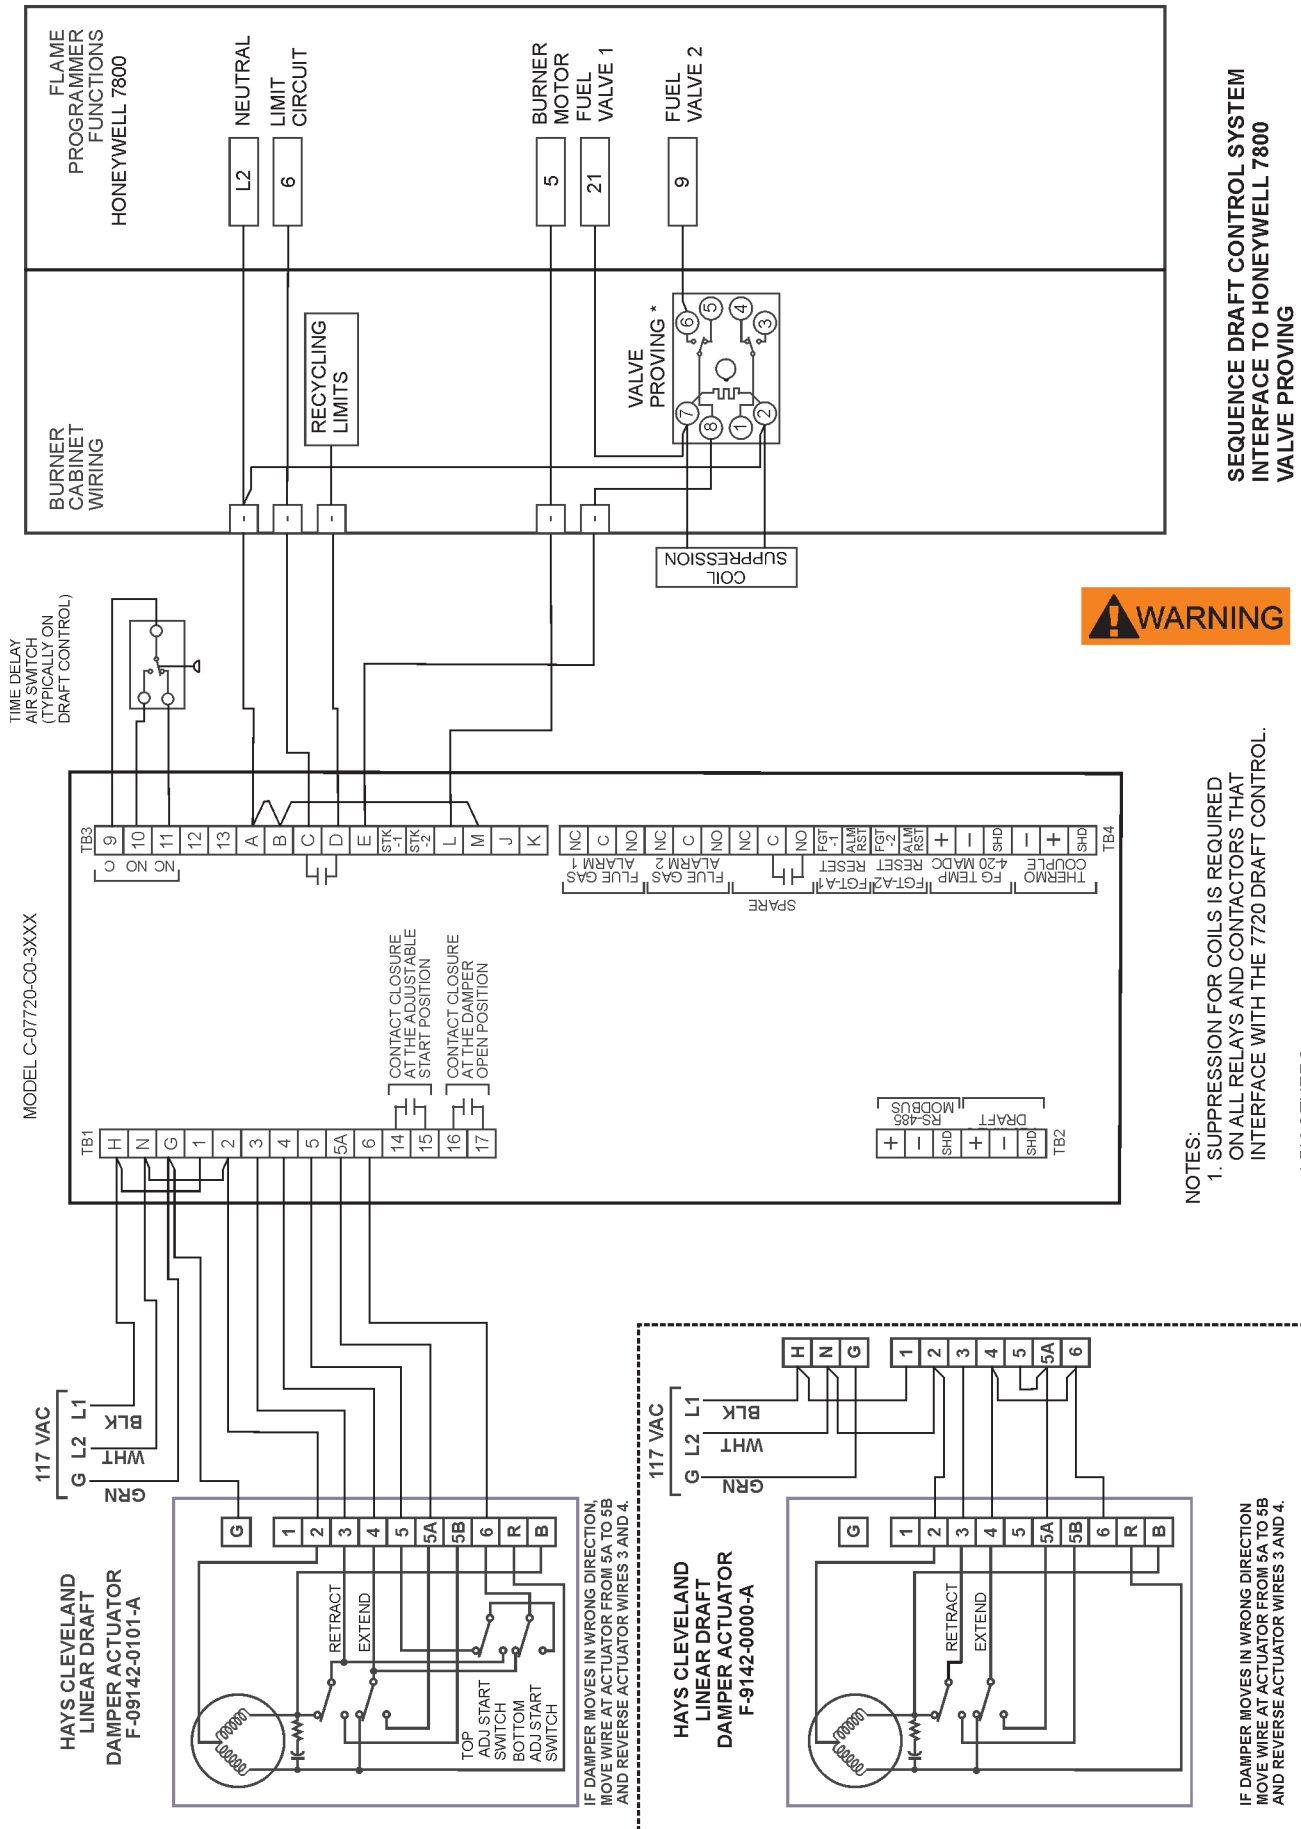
Series C-07720-C0-3xxx Draft Control Interface with Honeywell 7800 Valve Proving.
